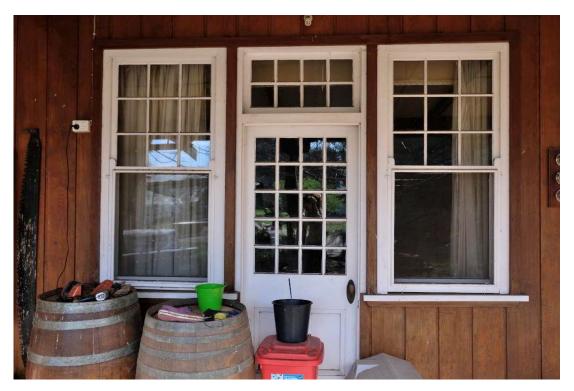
View of east elevation under veranda, showing vertical clear finished timber cladding and white painted, multi-paned joinery.
